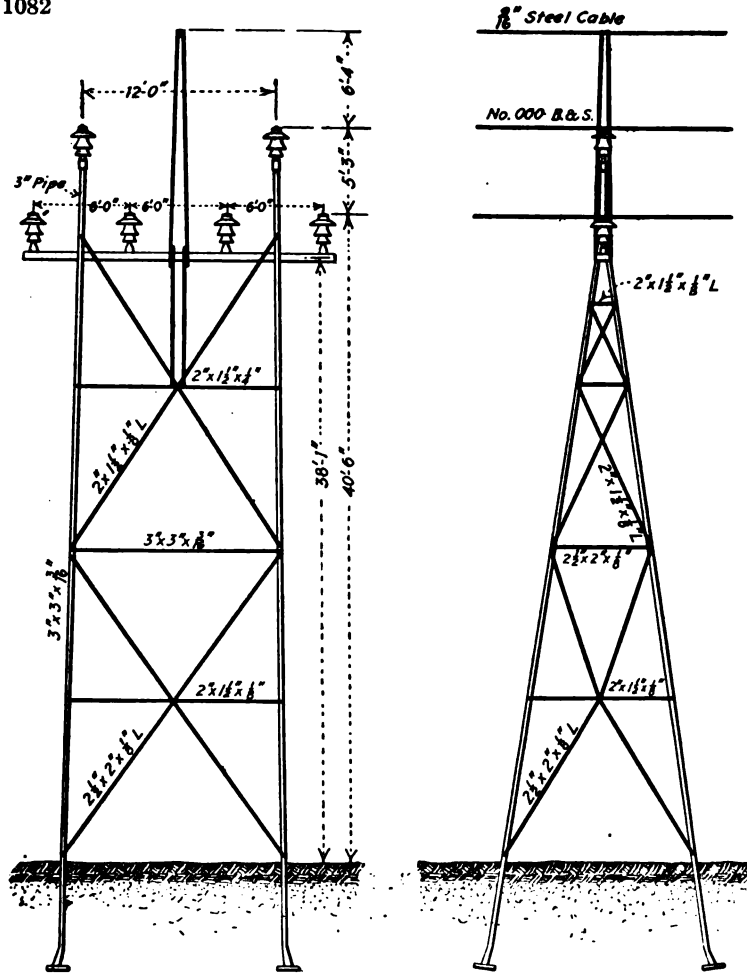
MEXICAN LIGHT AND POWER CO., LTD. CONSTRUCTION OF STANDARD TOWERS
